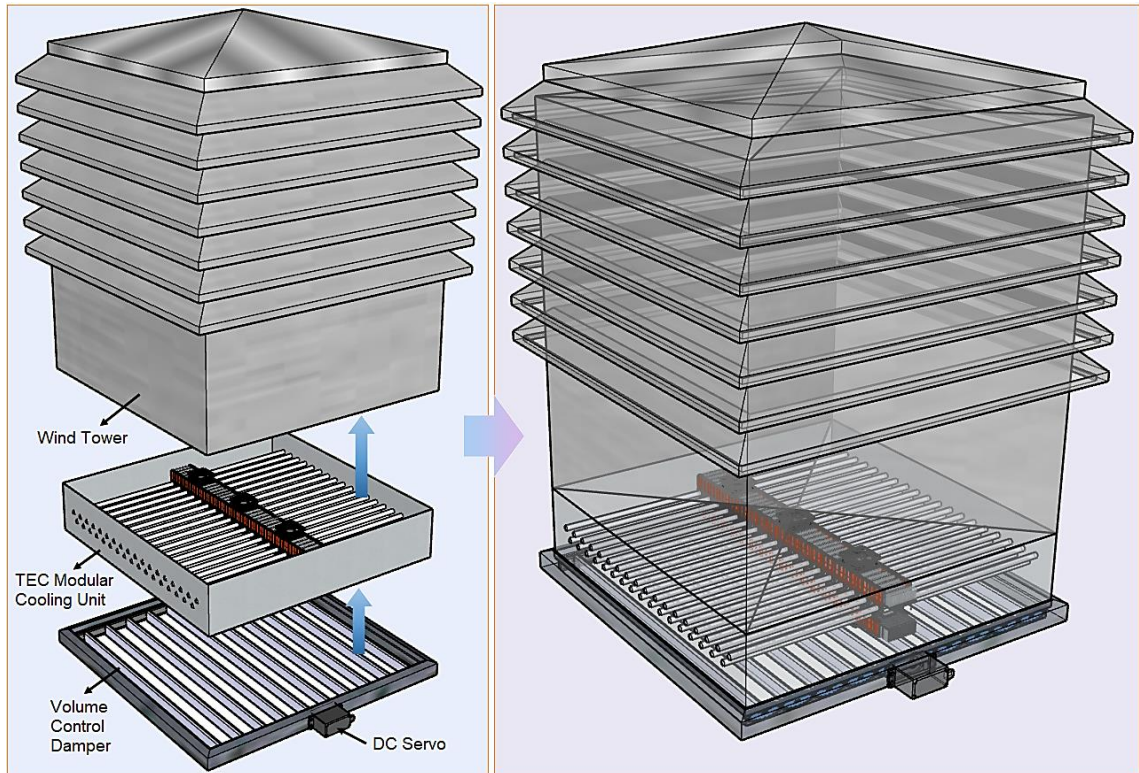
Damper, Cooling Unit, and Wind Tower Integration
